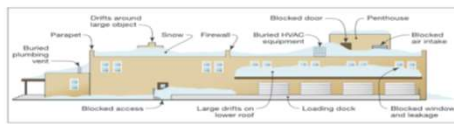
Unbalanced snow load from drifting and sliding snow on typical commercial or industrial building
